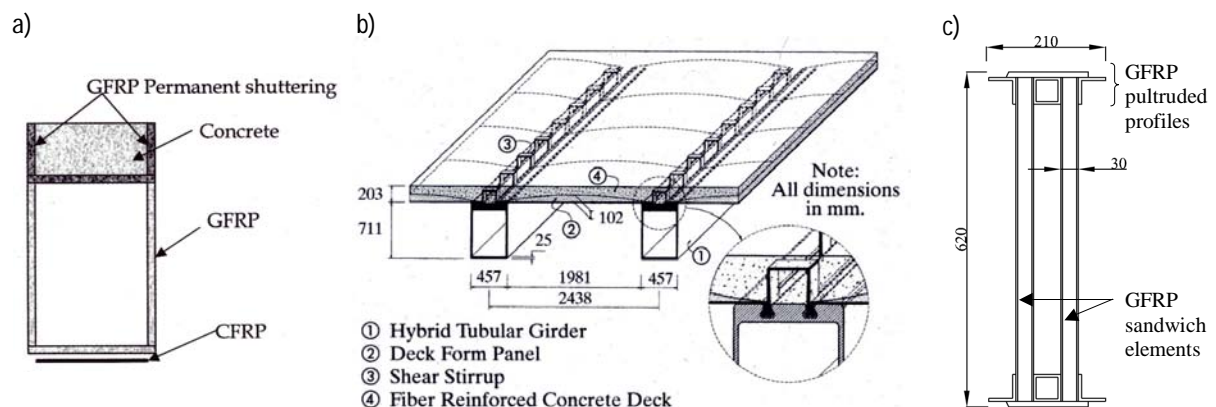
Redundant system – cross-sectional redundancy: (a) hybrid GFRP/CFRP and concrete section (Triantafyllou and Meier 1992), (b) modular bridge system incorporating GFRP/CFRP girders and fiber-reinforced concrete deck (Karbhari and Seible 1999), (c) hybrid girder with GFRP sandwich panels and pultruded profiles adhesively-bonded (Keller et al. 2004)
